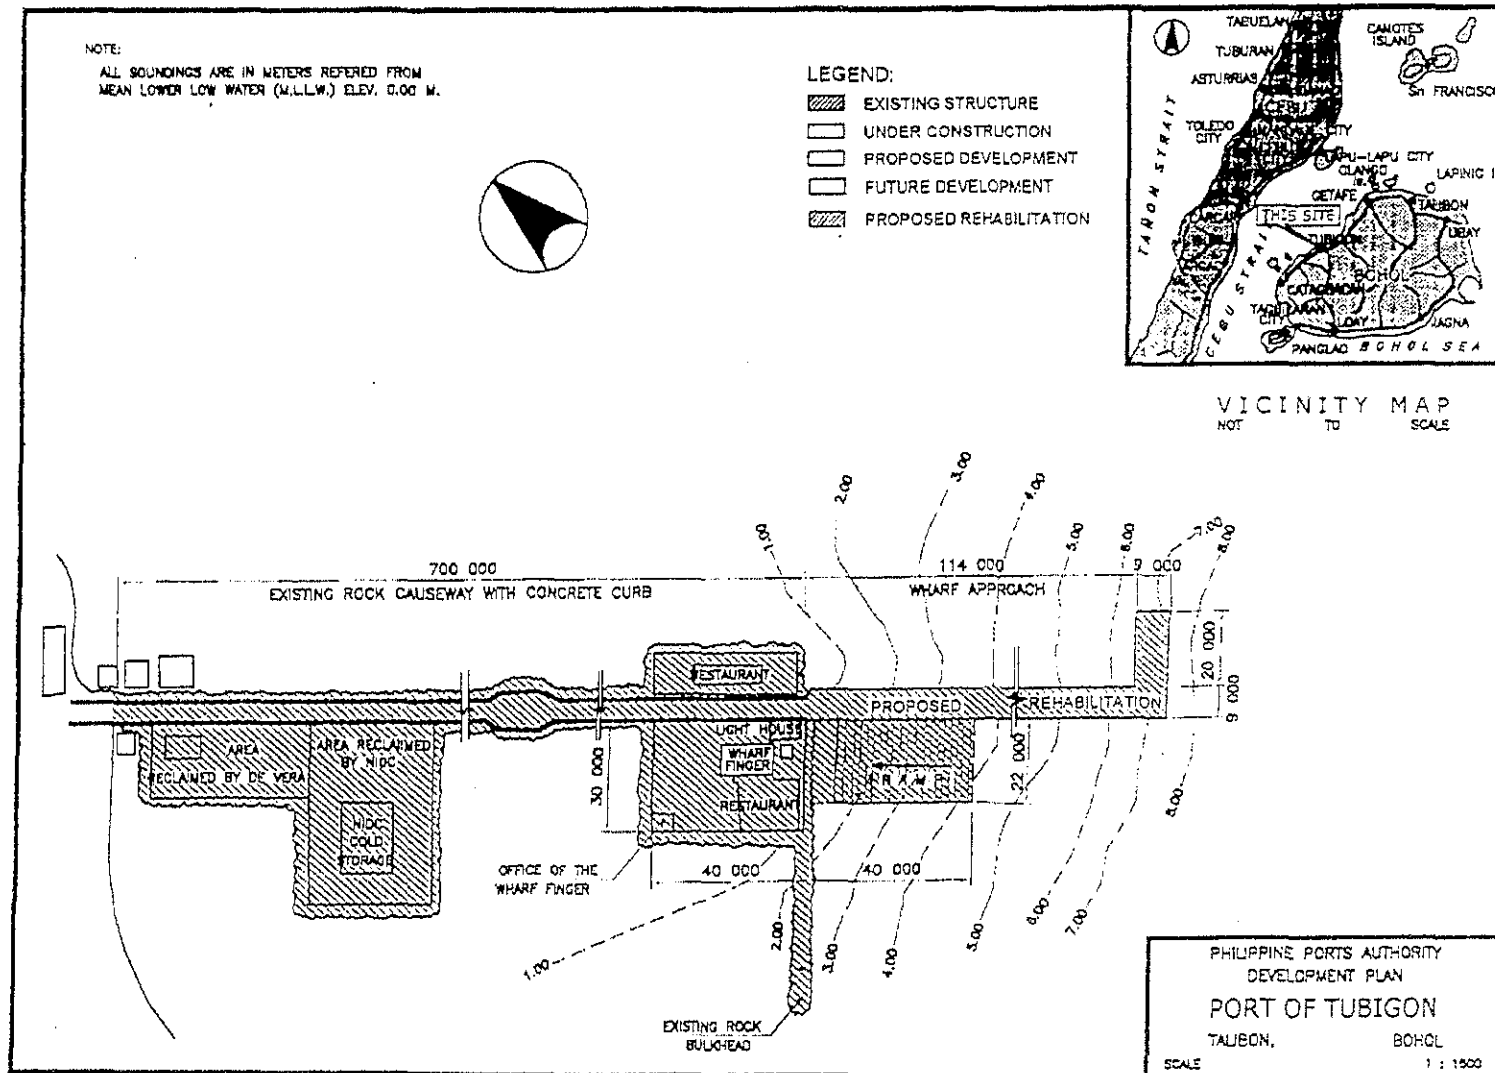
Development Plan - Port of Tubigon
